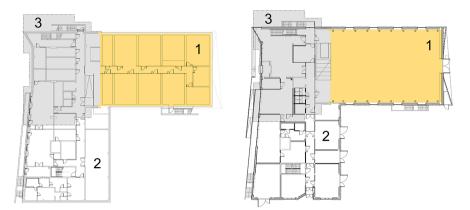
Basement (left) and the ground floor plan, Mäemaja building. The structures of the old test hall (1) were mainly preserved and spaces with poor functionality (3) demolished. New, larger office part (2) was construced with a CLT timber frame.
